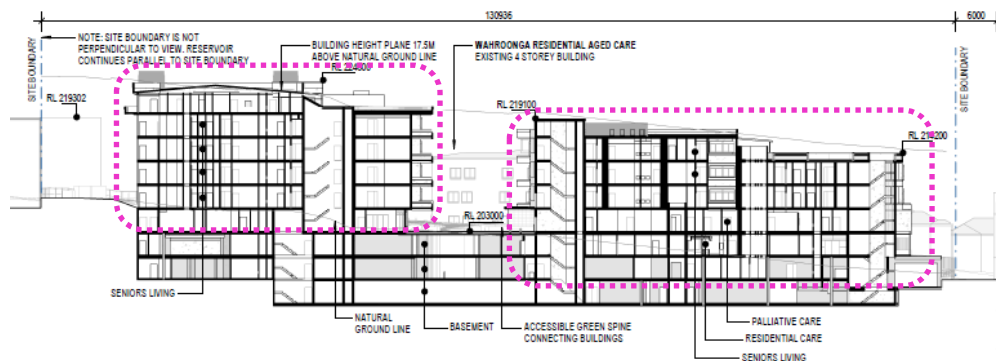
A portion of the proposed section through the site from north to south, looking west, showing how the new proposal has been designed to take into consideration the existing topography of the site. The two separated forms are indicated by the pink outline. (Source: Bickerton Masters Architecture)
